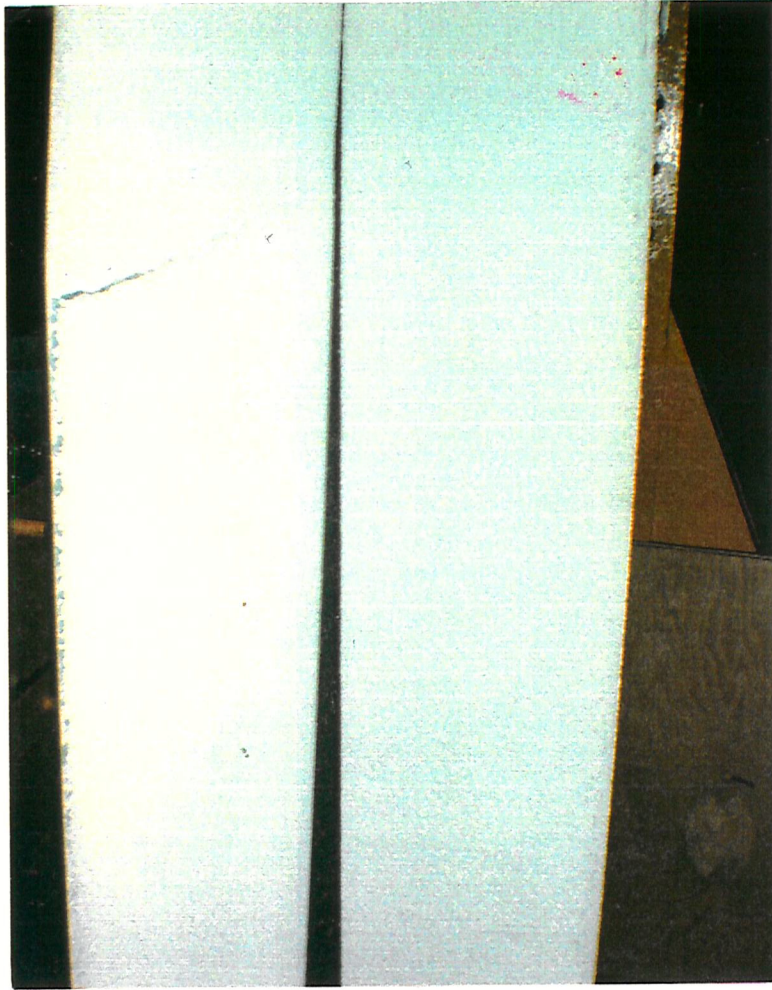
Core shear failure for specimen 2B (Second shear test)
